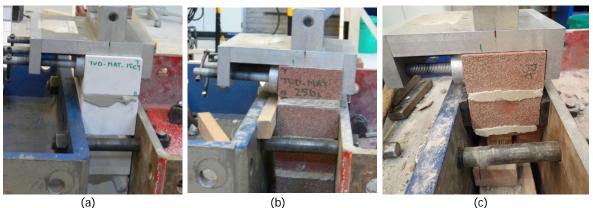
Retraining frame: (a) steel beams; (b) steel beams with a wooden strip; (c) steel beams with rubber strips.
